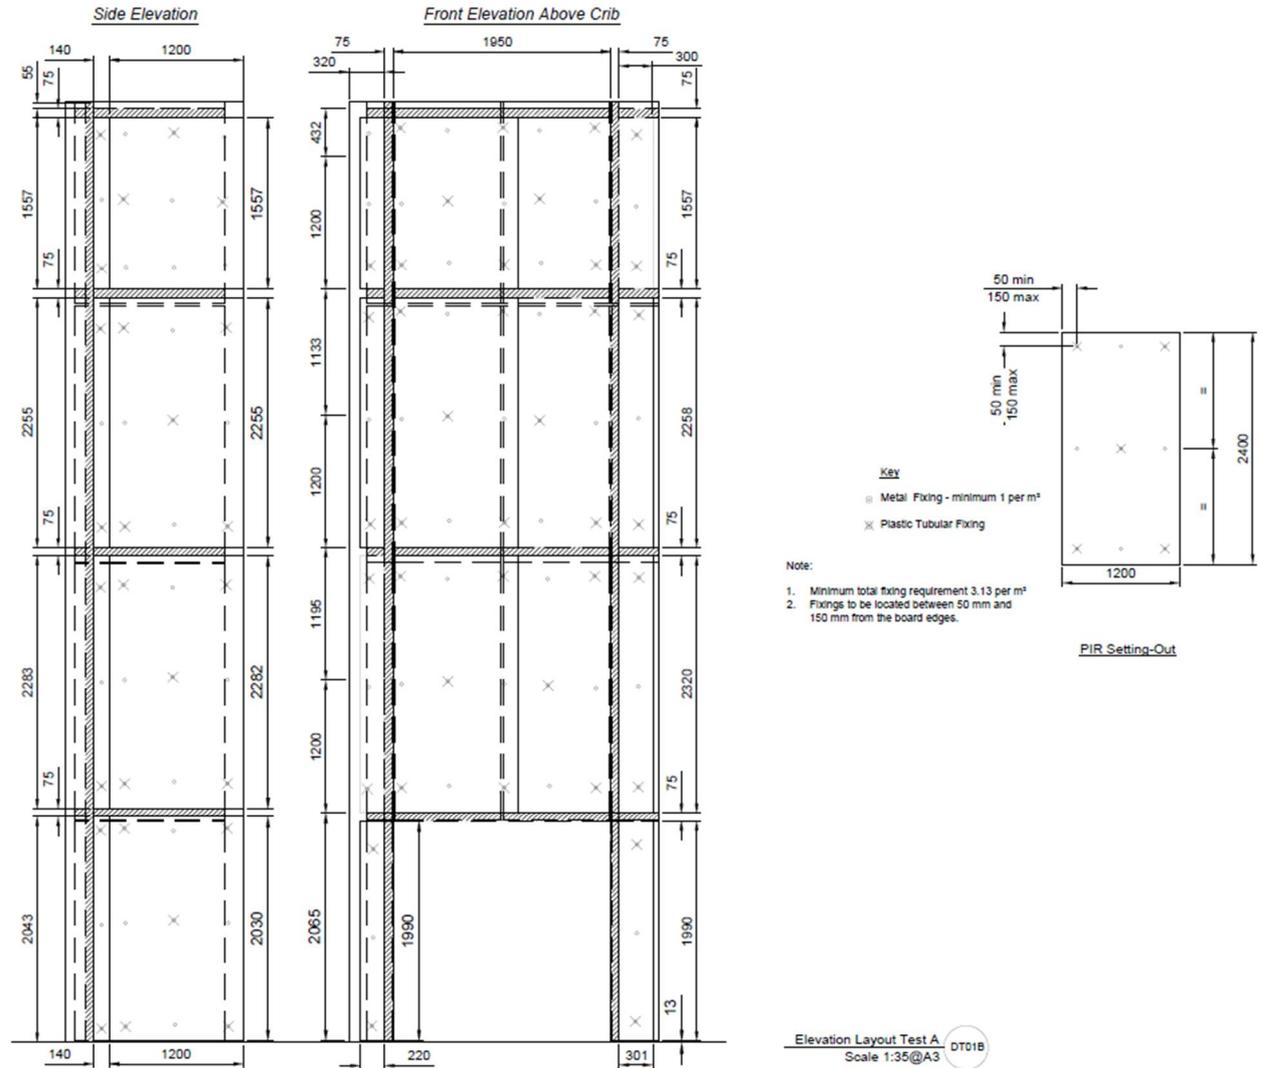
Front elevation, side elevation for the insulation panels installation (supplied by the Test Sponsor).
